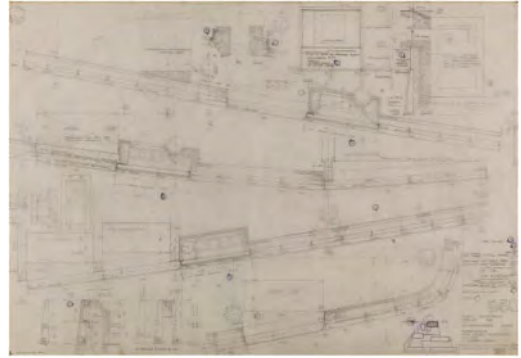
Ralph Erskine, 1:10 drawing of the envelope of the ground floor and the basement of the highest building of Kvarteret Ortdrivaren, 1959. From ArkDes Collections (ARKM.1986-17-2288-001).
